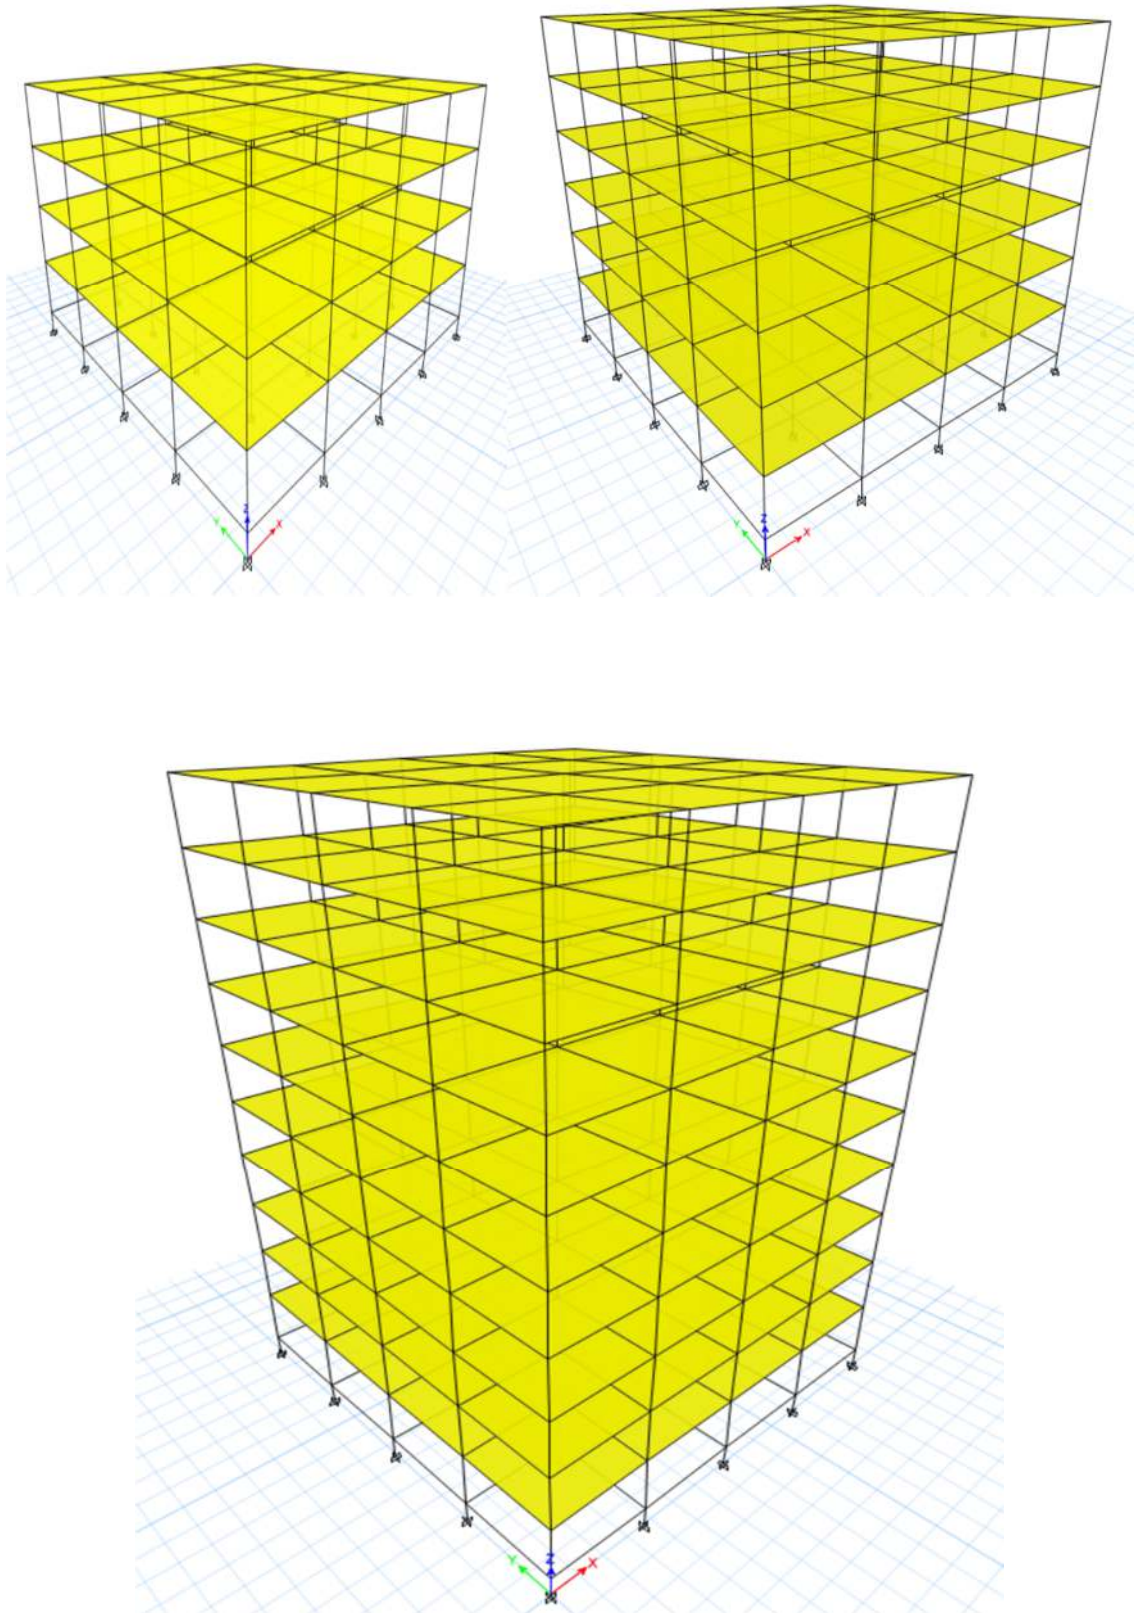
3D views of 4, 6 and 10-storied buildings
